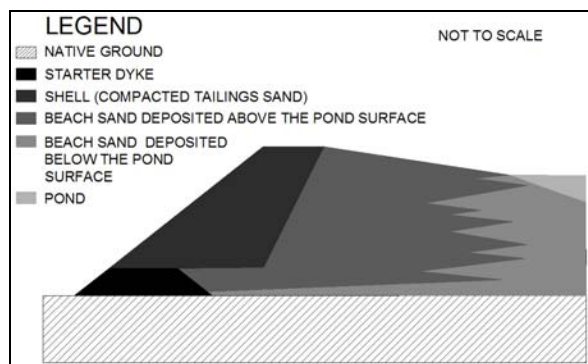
Upstream construction oilsand tailings dyke – typical section.
